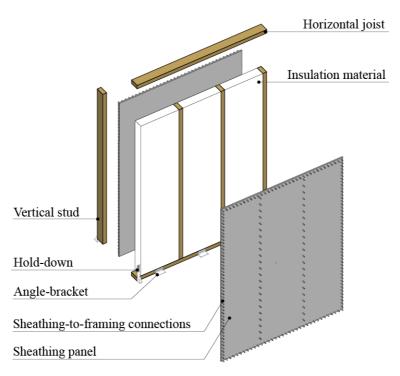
Typical structural configuration of a fully anchored timber light-frame shear wall sheathed on both sides.
